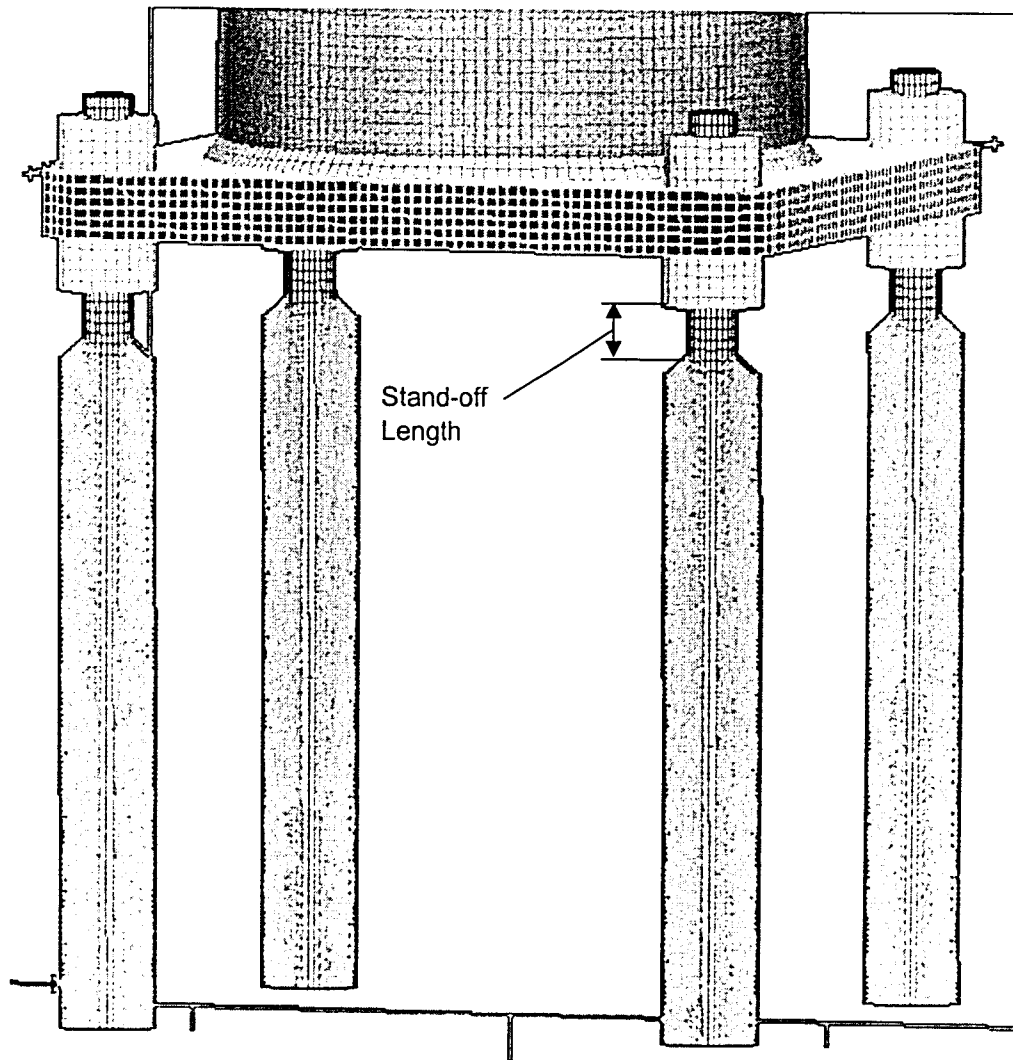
Anchor Rod Surface Constraints, Representative of Concrete Foundation
